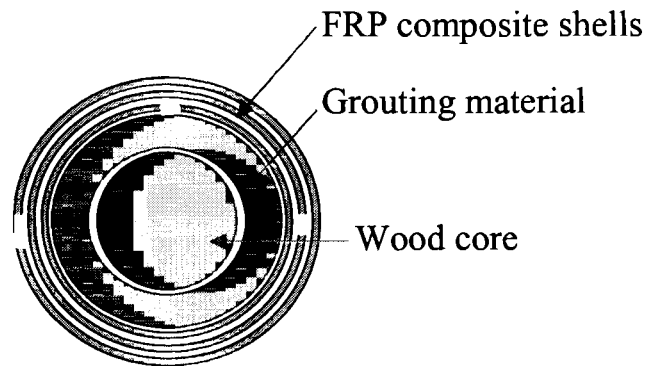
Cross-Section of Wood Pile Repaired with FRP Composite Shells
